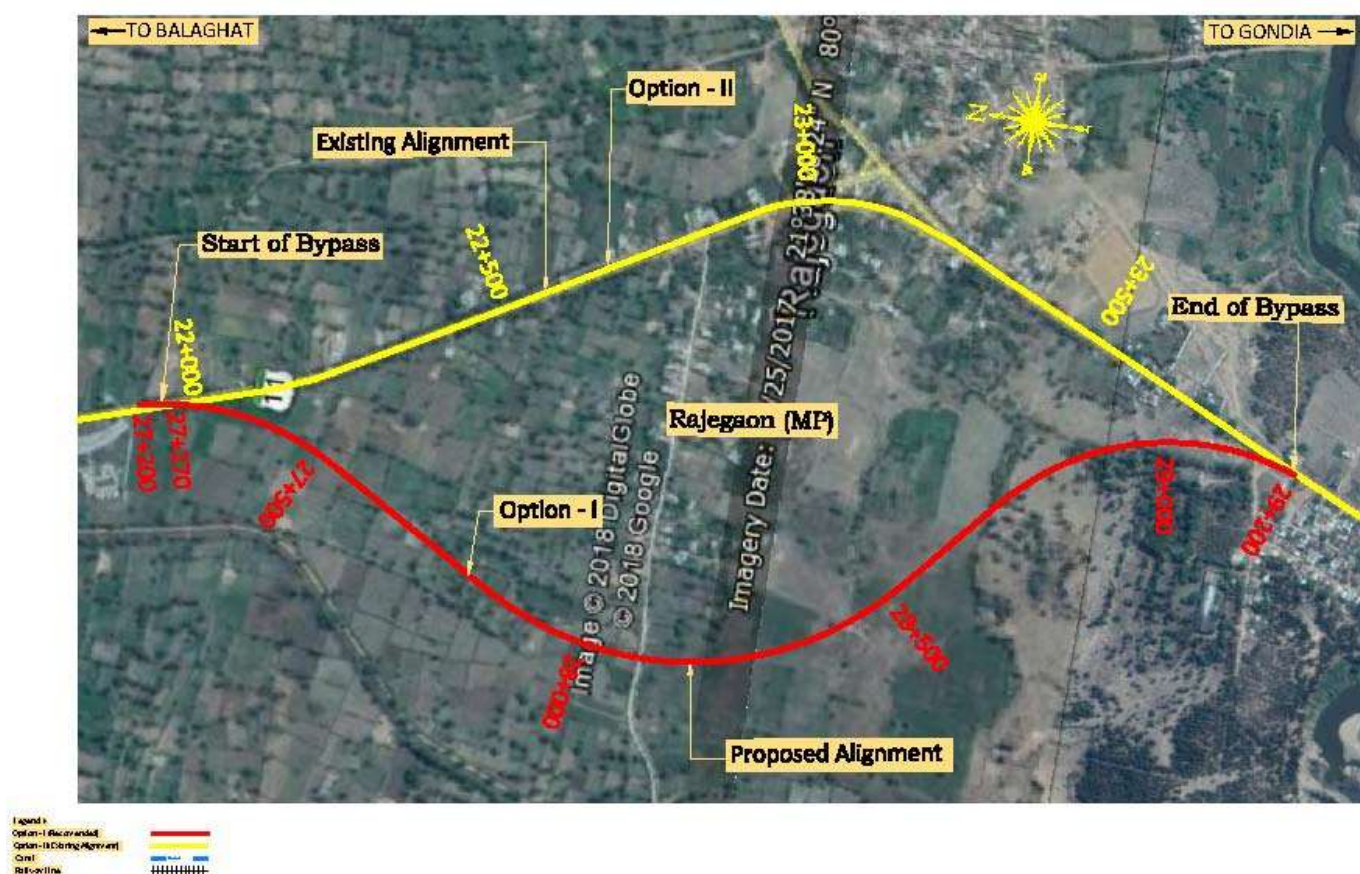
Alignment proposal for Rajegaon Bypass in Madhya Pradesh
